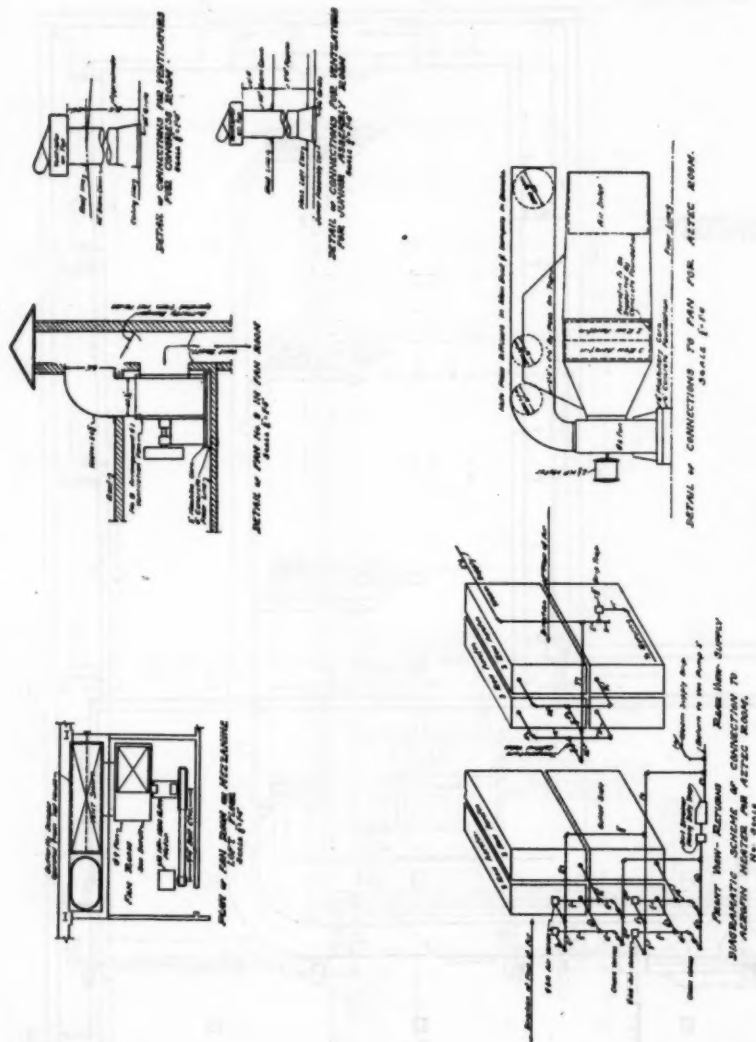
DETAILS OF HEATING AND VENTILATING EQUIPMENT CONNECTIONS
